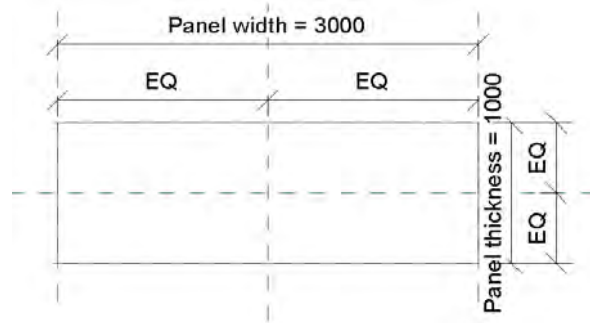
Cross-Section View of Diaphragm Wall
